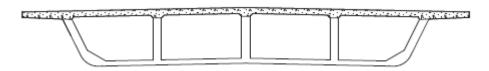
Typical Box Girder Cross-Section (Dead Load)
